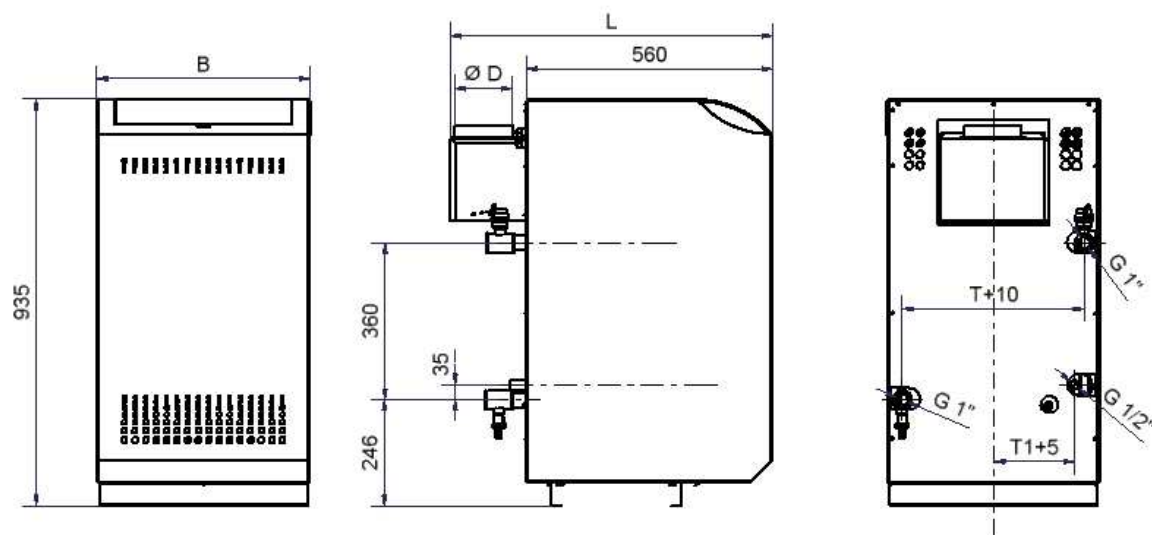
Connection to the heating system and the draught diverter assembly
